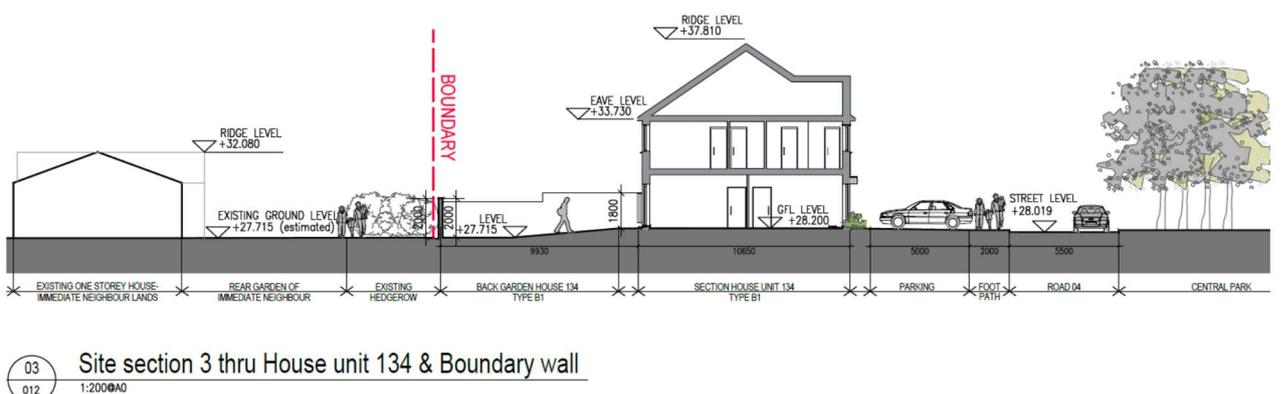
Site Section 03 taken from submitted drawing no. 6204-P012
